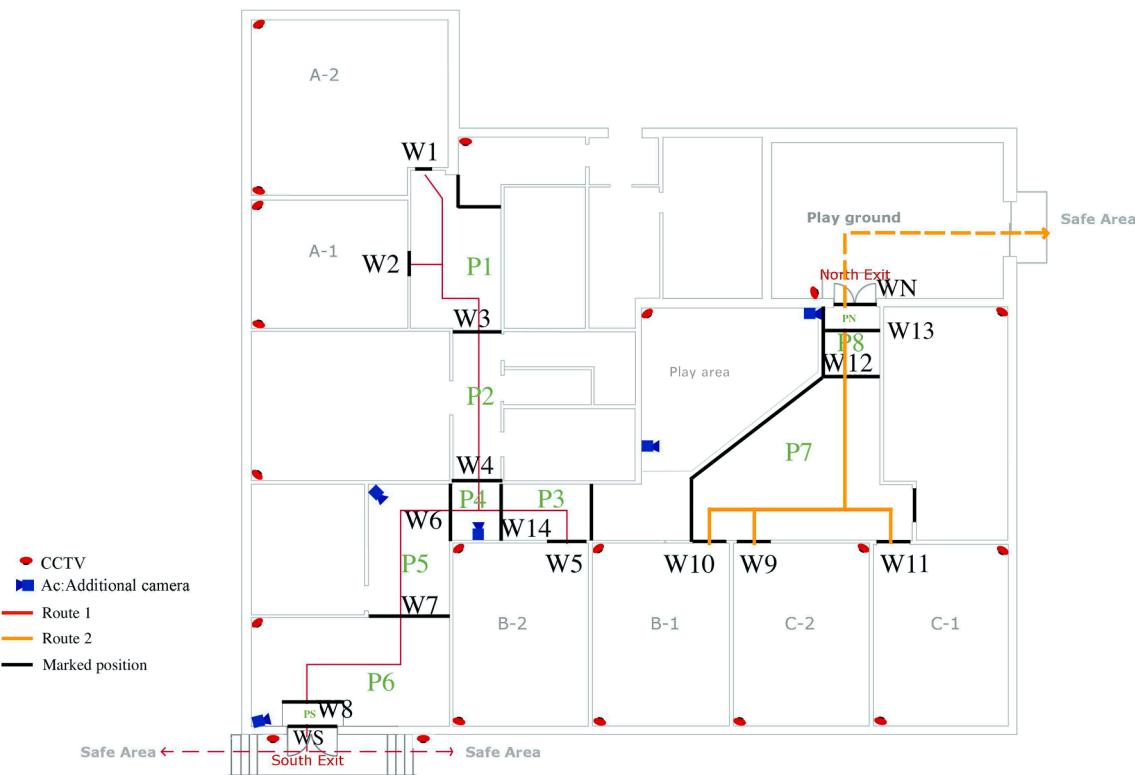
The floor layout of the kindergarten, camera locations and evacuation routes.
